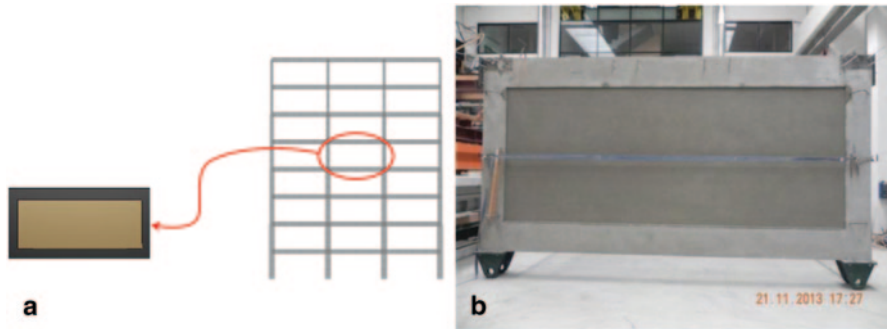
Wall panel of typical RC frame building a schematic view, b test specimen
